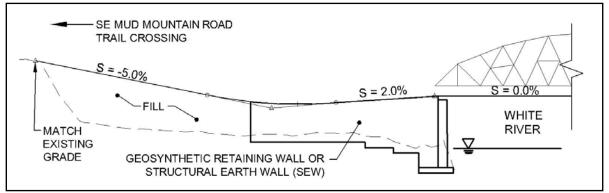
Northern White River Bridge Trail Approach – Alternative 1, Fill Slope and Walls
